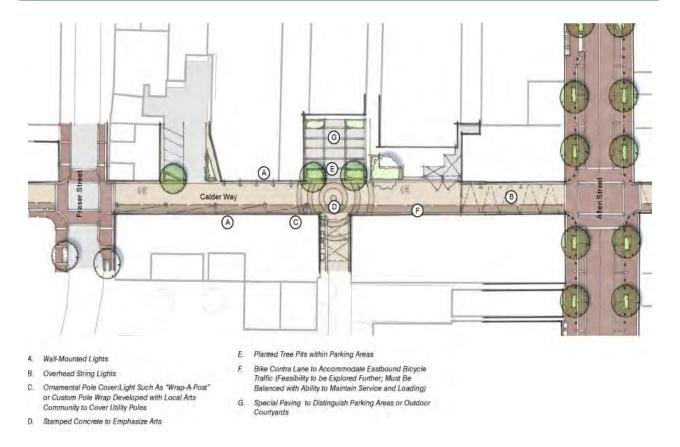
Calder Way Concept Plan, Fraser Street to Allen Street 53
